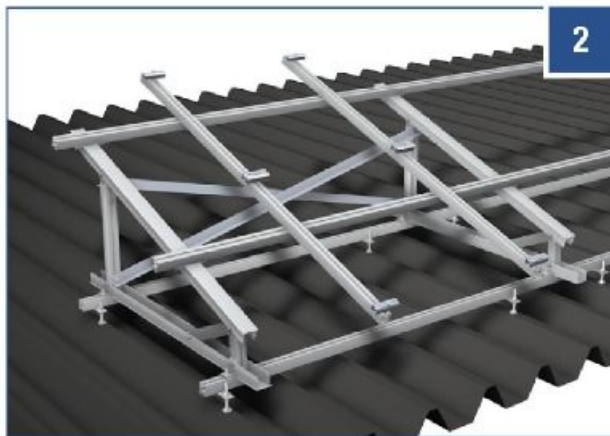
When laying frameless PV modules, assembly in cross bracing is possibly laid down. Please refer to and comply with the assembly specifications of the module manufacturer
